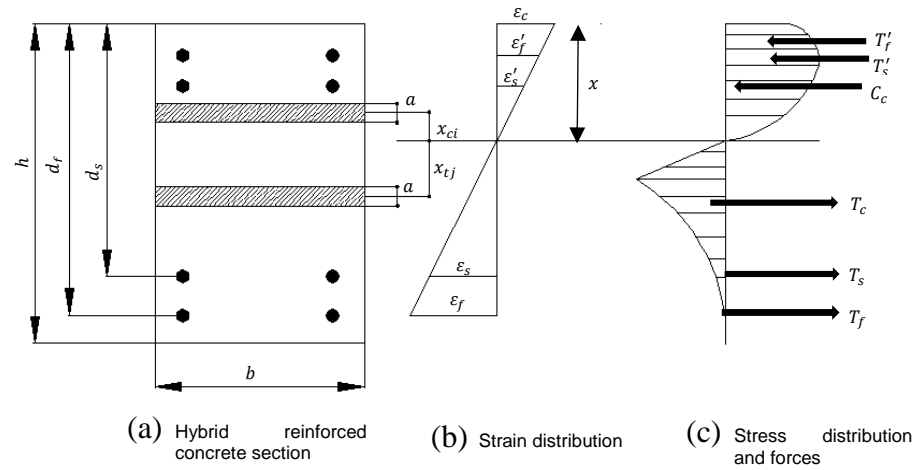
Strain, stresses and forces of a reinforced concrete section
